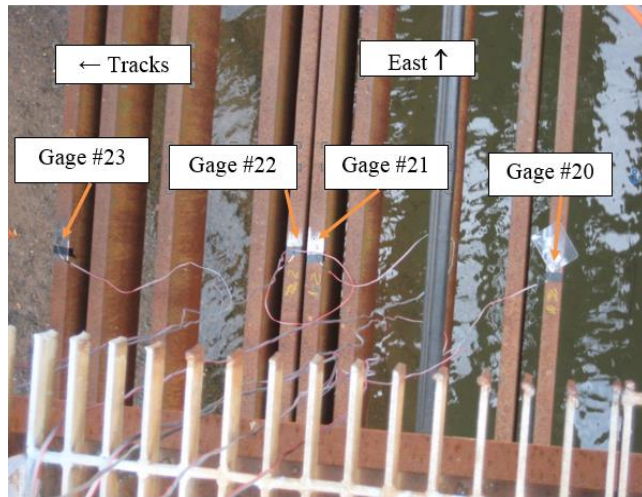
Location of foil strain sensors, lower chord L6-L8, south truss (a set of 10 eyebars, each 10" x 1 7/16" in cross section).
